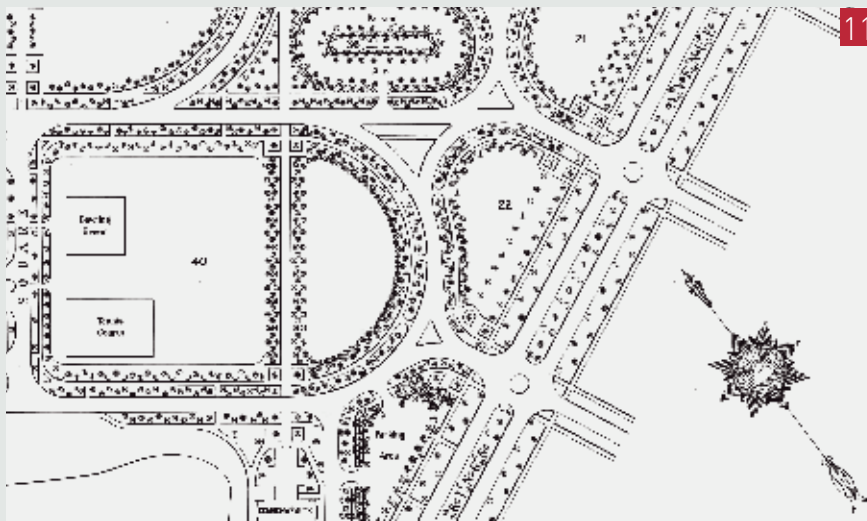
Permanent Planting Plan 1928 showing the Weston planting pattern in the median 2/1/2, and staggered verge planting
